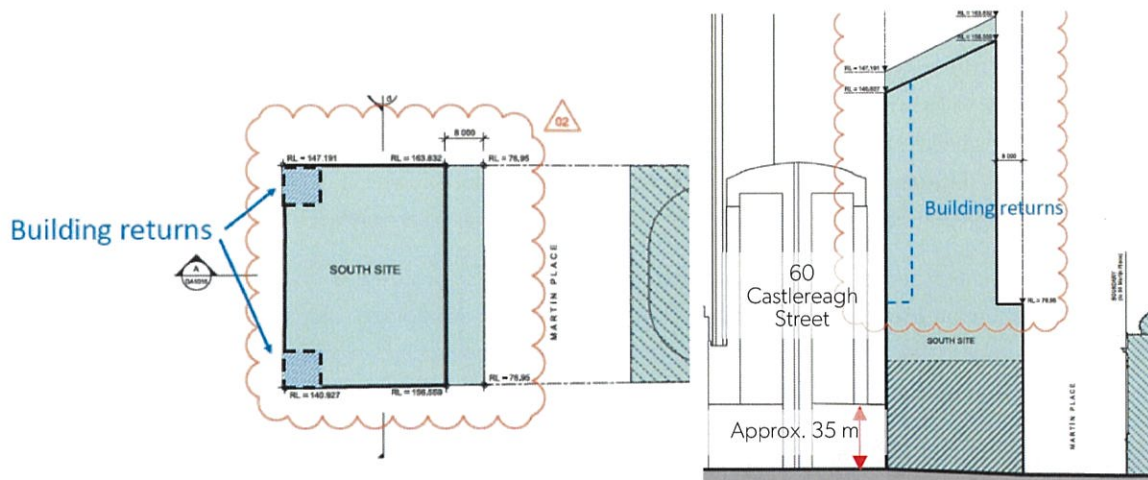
| Extracts from Council's objection requesting 8 m by 8 m building returns to be provided at the southern corners (Left: plan view, Right: Castlereagh Street Elevation) (Source: Council's submission to Amending Concept SSD 9347)
